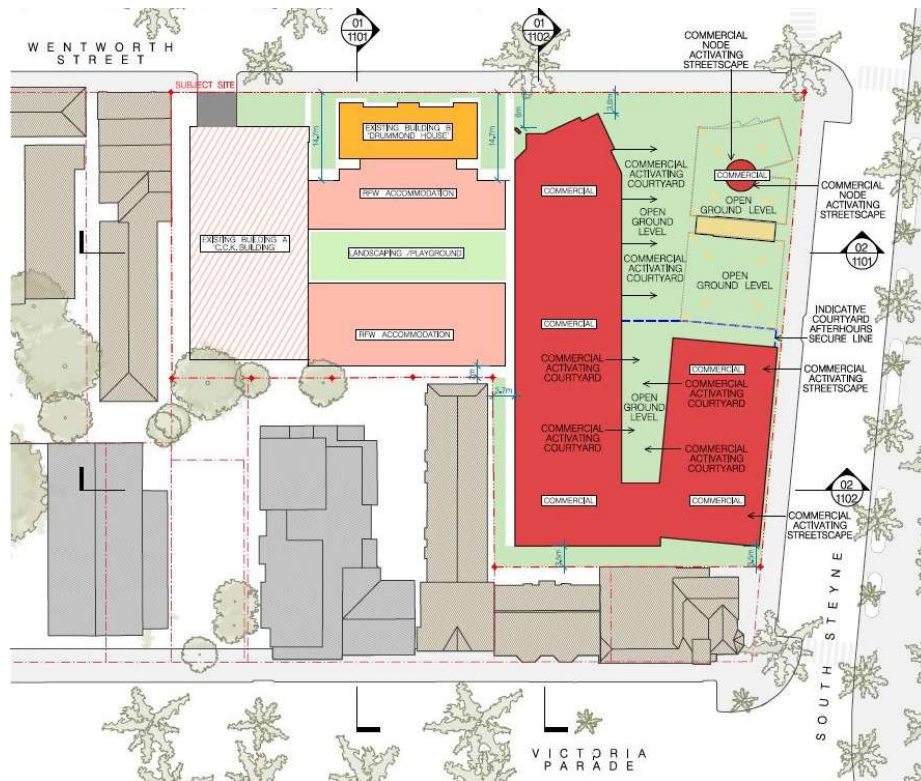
A diagram illustrating key design aspects of the S75W ground floor plan.
